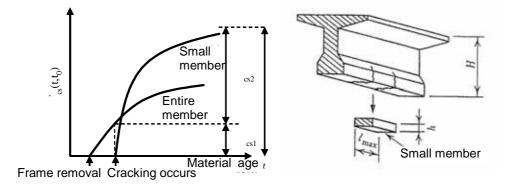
Evaluation method for concrete shrinkage between cracks⁷
